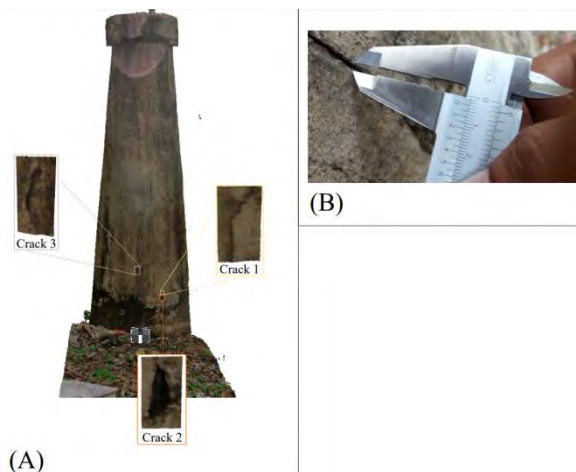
(A) Scanned cracks using TLS (B) Measurement of crack 1 using Vernier scale
